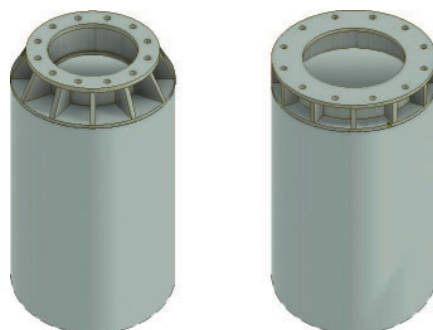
Nodes for connecting base sections with intermediate and anchor and angle reinforced concrete power transmission poles
